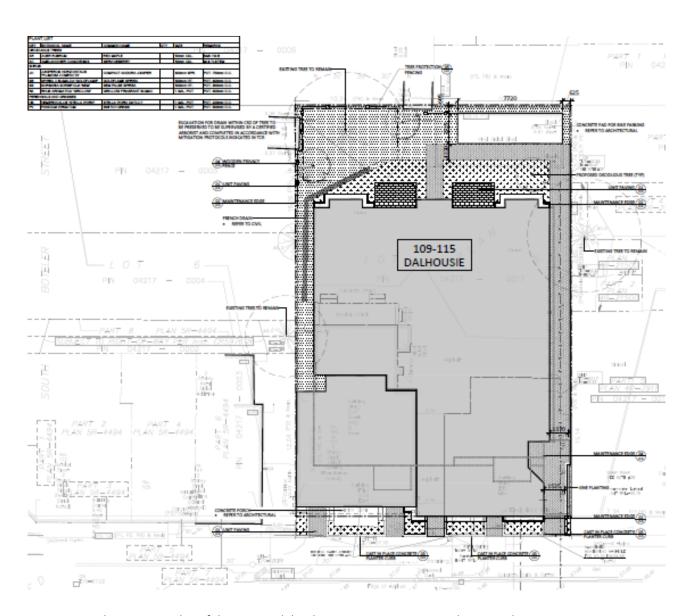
Preliminary site plan of the proposed development. Source: CVS Landscape Architects 2022.
